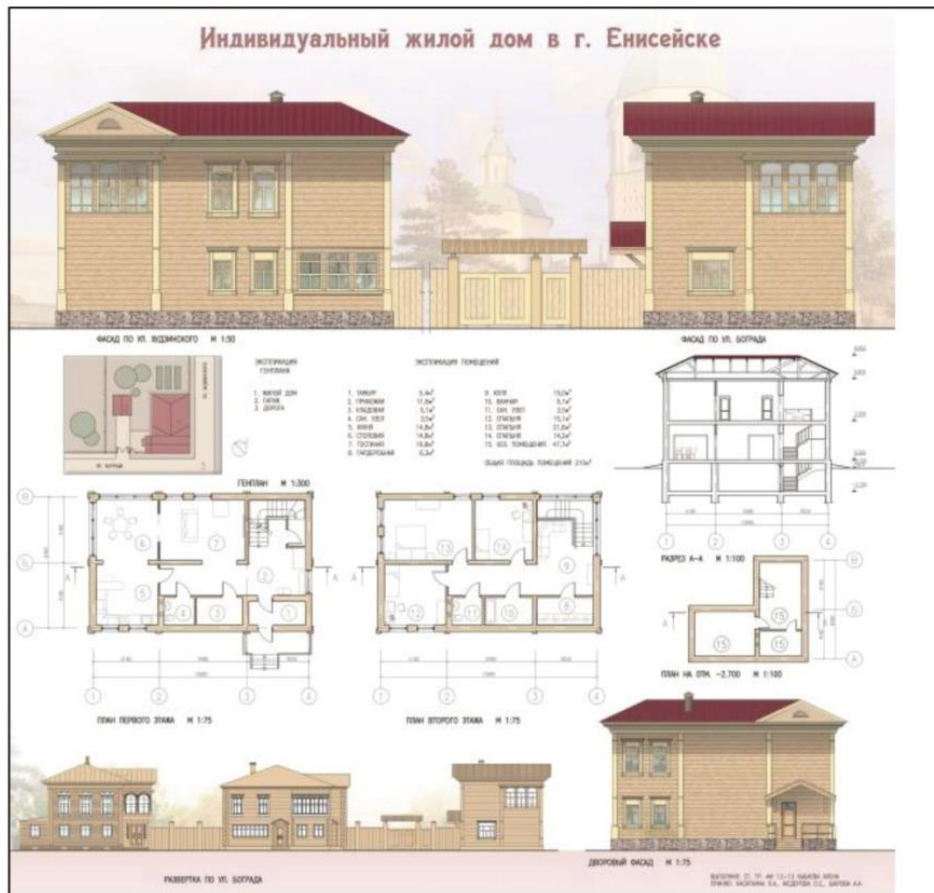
The wooden residential house design for building in Yeniseisk. Author A. Emashkina
